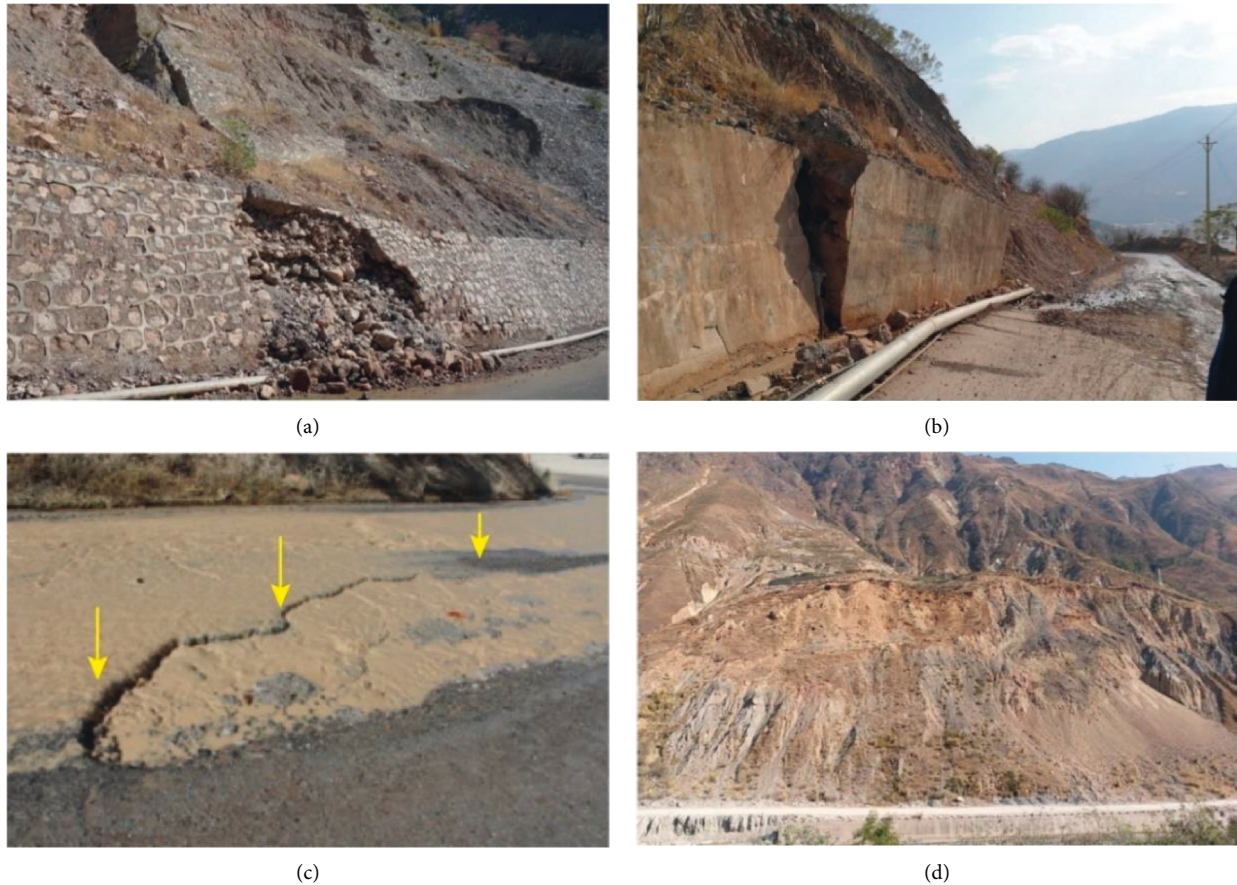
Photographs of deformation signs of Wangjiashan landslide: (a) broken retaining wall; (b) toppling of retaining wall; (c) tension cracks in road surface; (d) landslide deformation on the front edge of the landslide.
